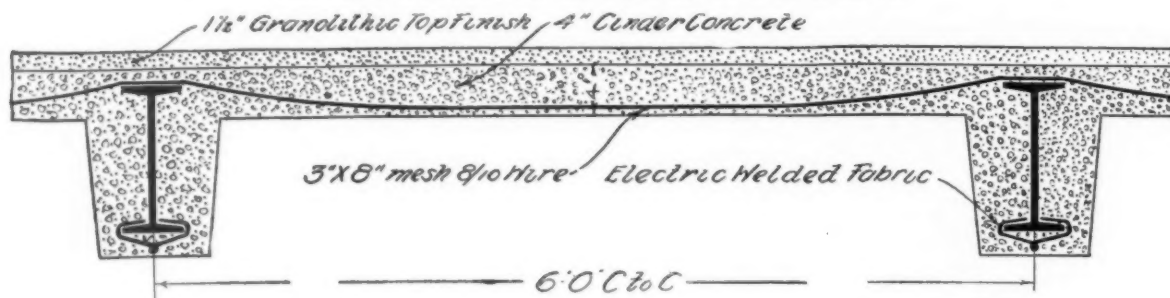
CROSS SECTION OF REINFORCED CONCRETE FLOOR, SHOWING THE GRANOLITHIC TOP FINISH METHOD OF FIREPROOFING SOFFITS OF BEAMS.
